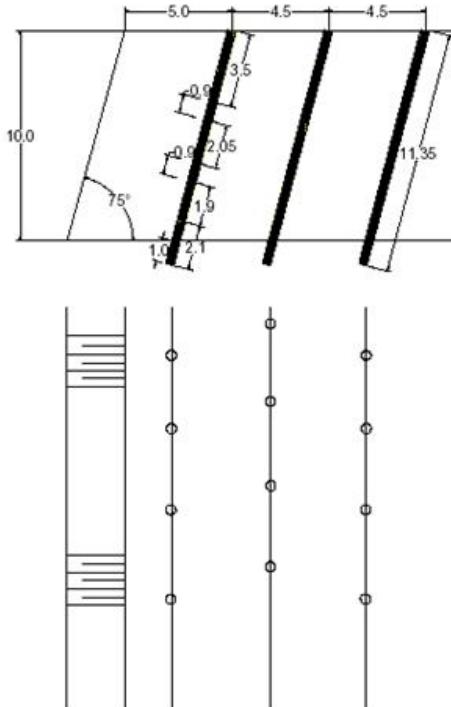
Construction of blast filling of borehole on overburden for $H = 10 \text{ m}$ - schematic view
